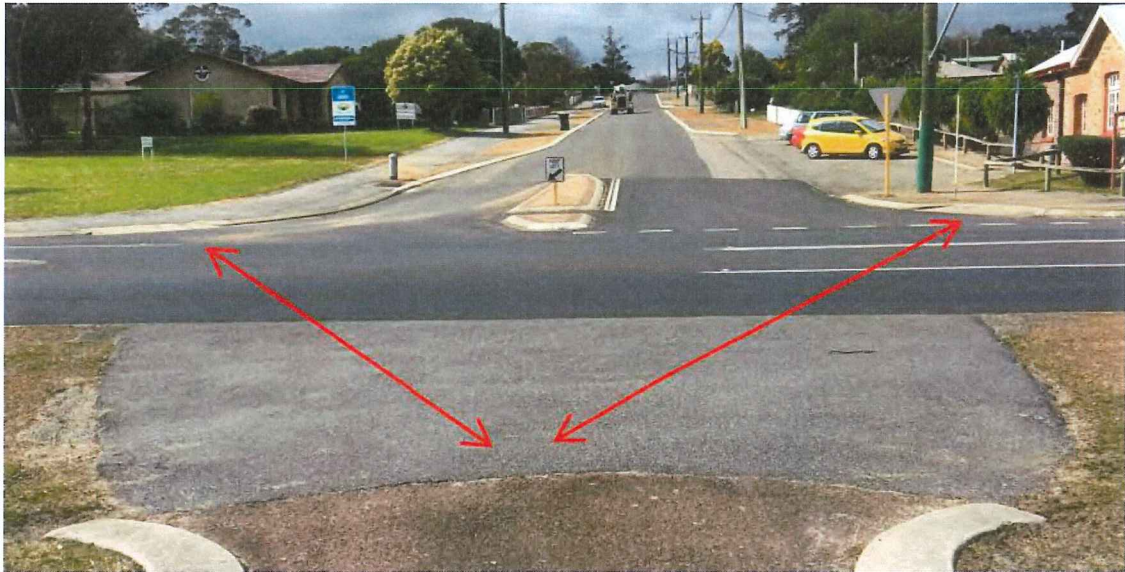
Ormond Road. Pram ramps; very unsafe diagonal access/egress across intersection
